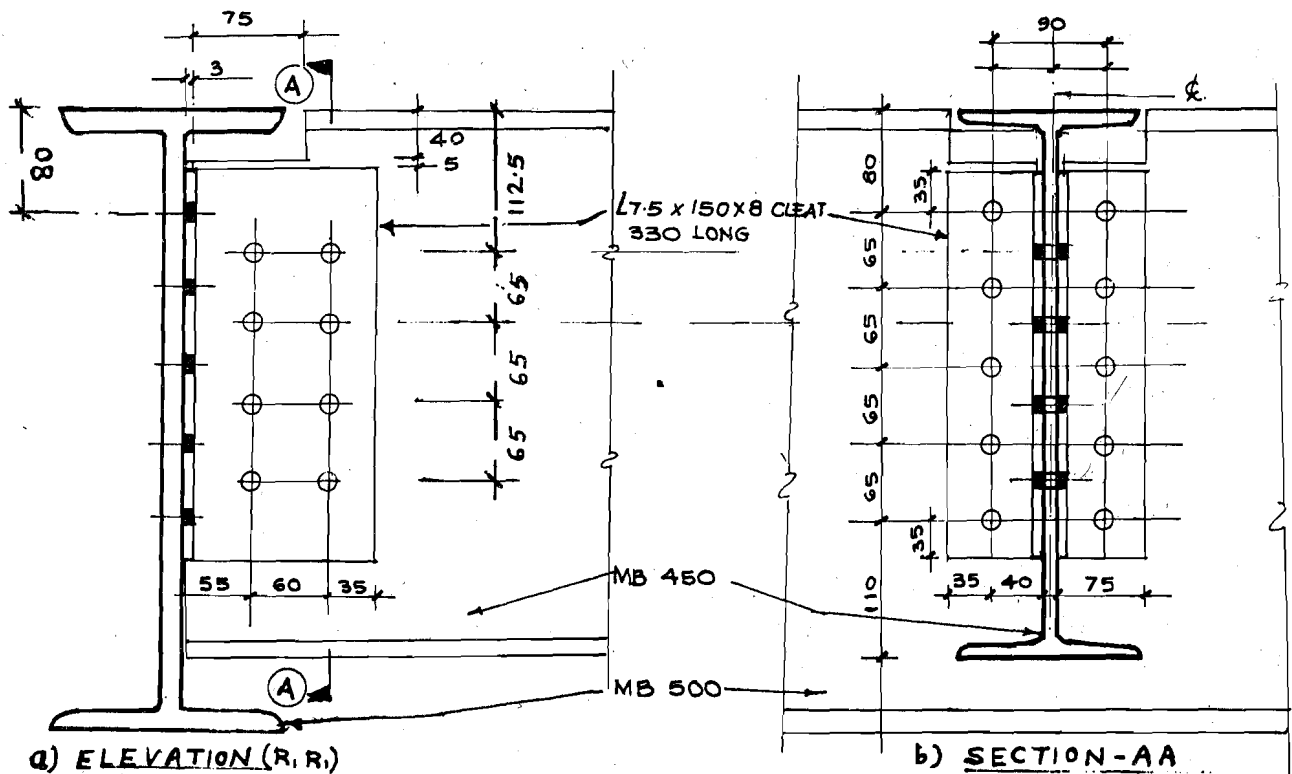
(b, b1, c) : Typical Structural Steel Floor System
